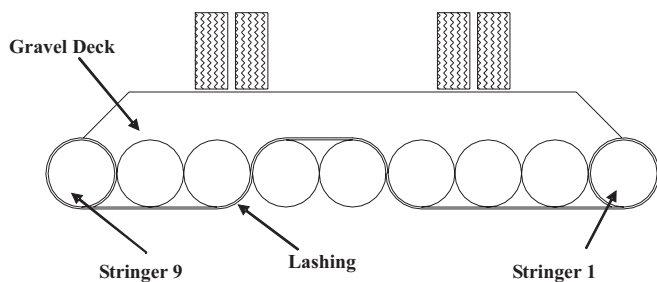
~ Lashing diagram for the Bear Lake bridge.
